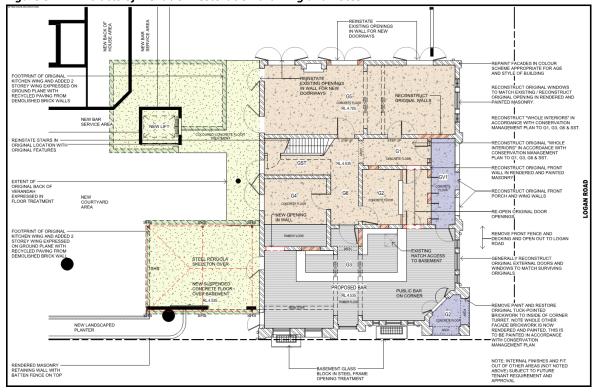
Ground Floor Detail plan of the Hotel restoration and rear heritage interpretation.
